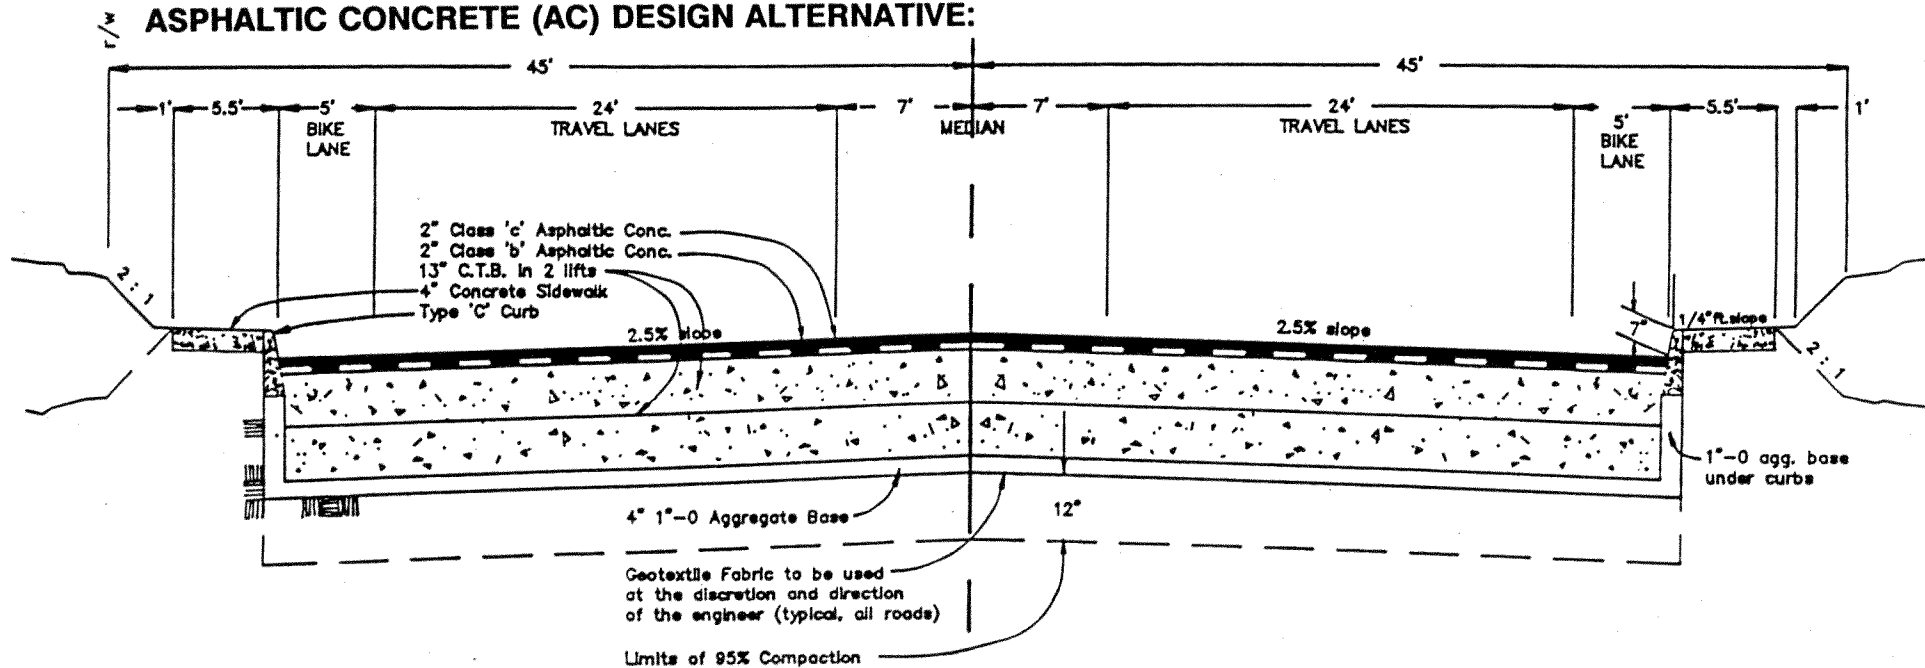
207TH AVENUE CONNECTOR: TYPICAL ROAD SECTION
